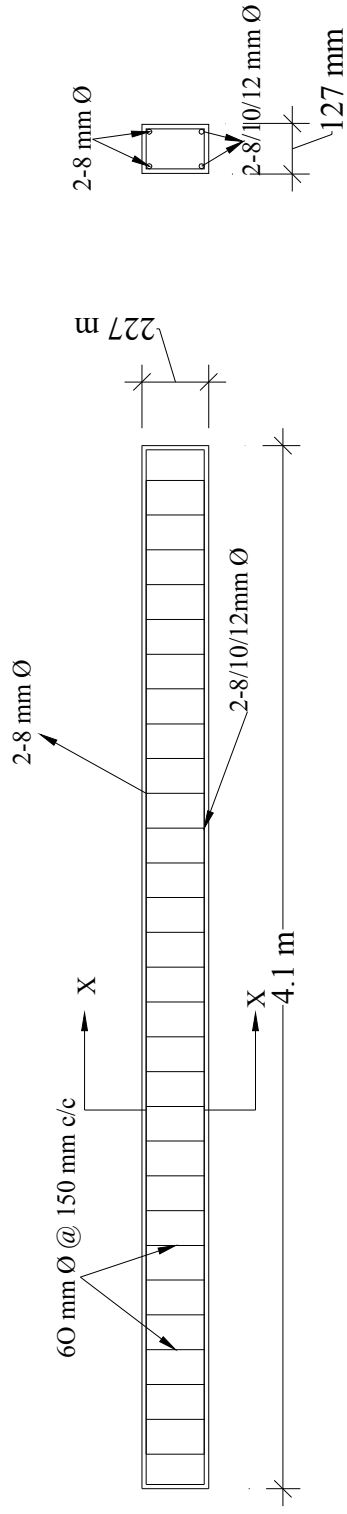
Longitudinal Cross-Section of Unretrofitted Beam
